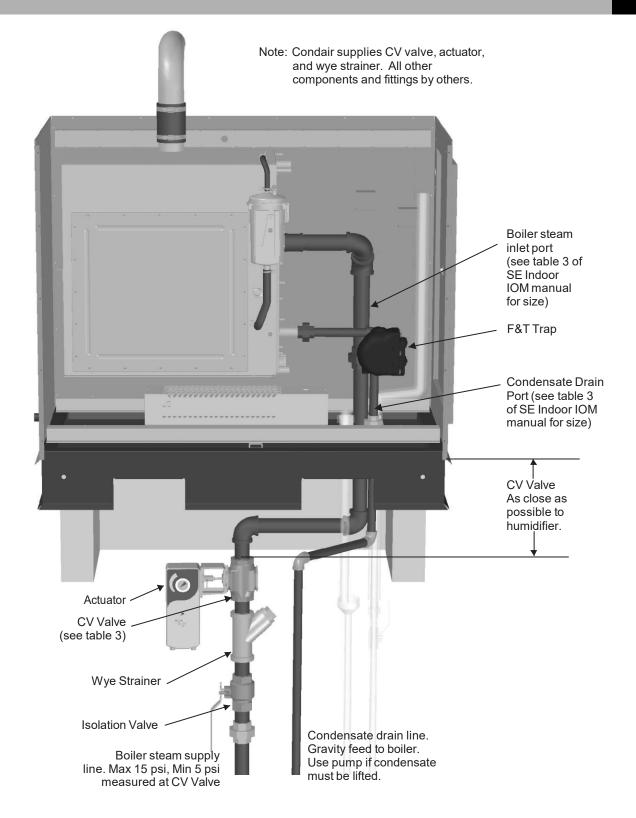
Nortec SETC Outdoor Boiler Steam and Condensate Connection
